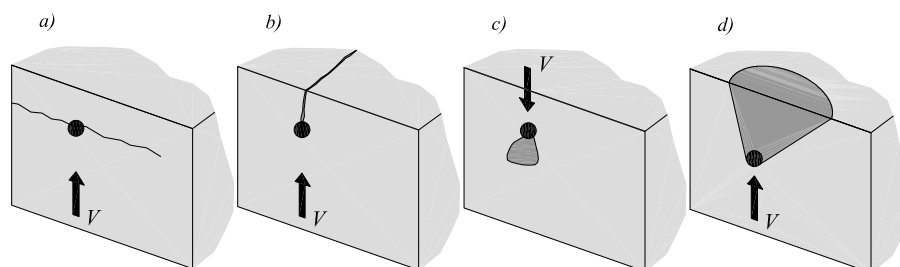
Failure of concrete: a) spalling, b) splitting, c) crushing, and d) breakout
